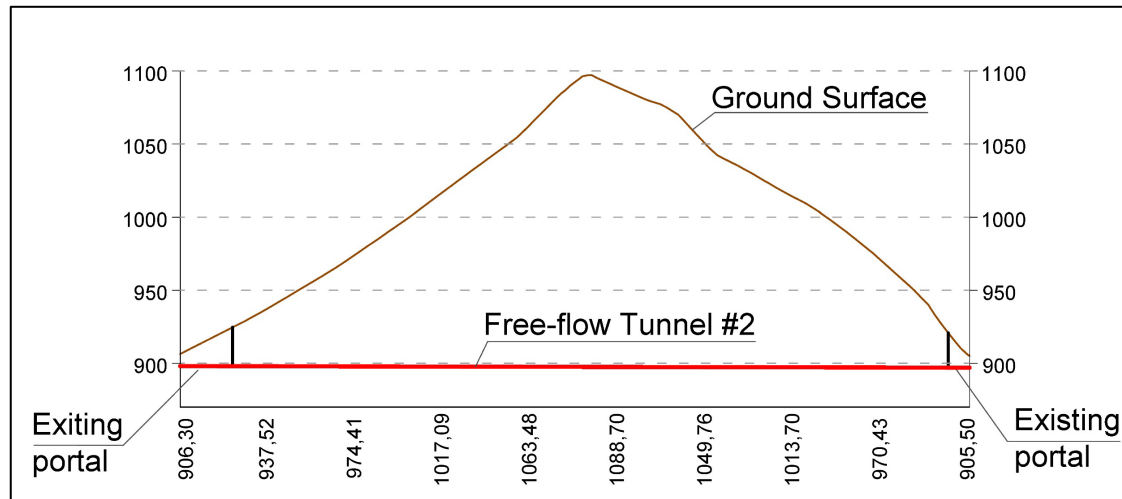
5 – Headrace tunnel N2 longitudinal cross section of Akavreta HPP
